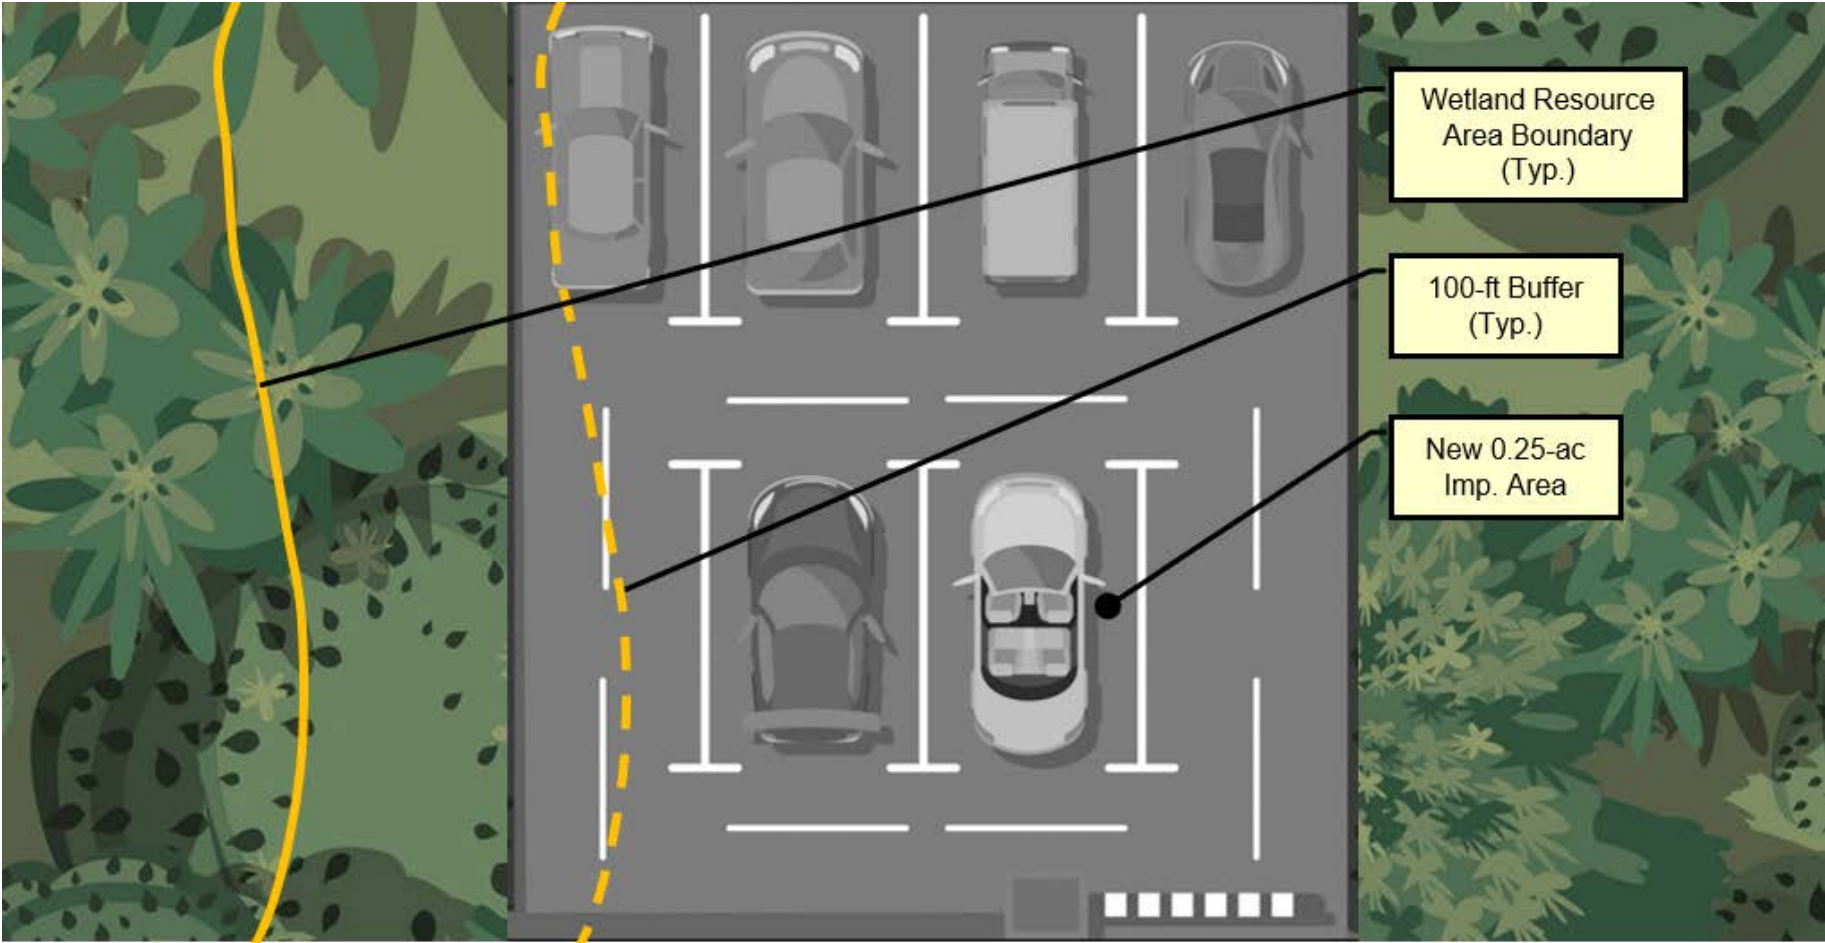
A. Proposed Site Conditions (add ¼-ac of impervious surface to existing forested site)
